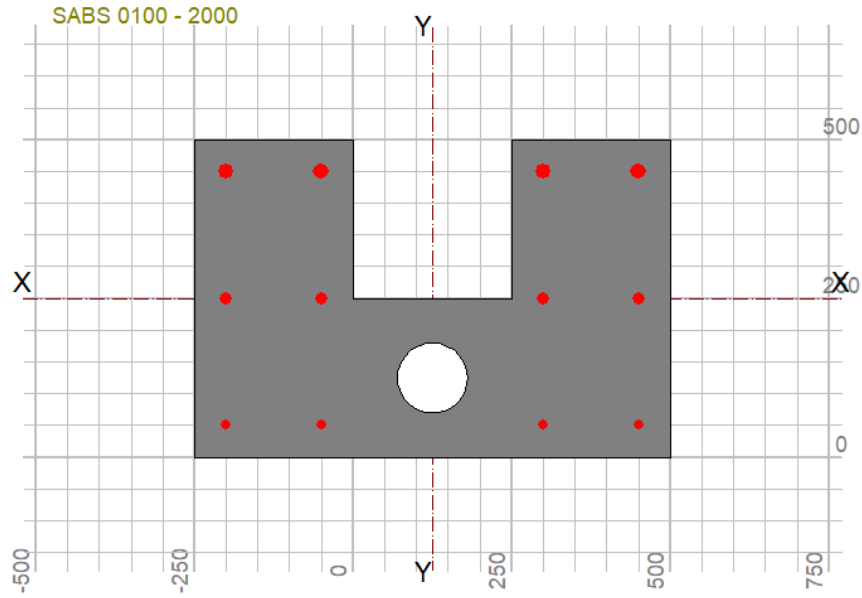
EXAMPLE INTRICATE CROSS SECTION IN THE GENERAL COLUMN DESIGN MODULE
